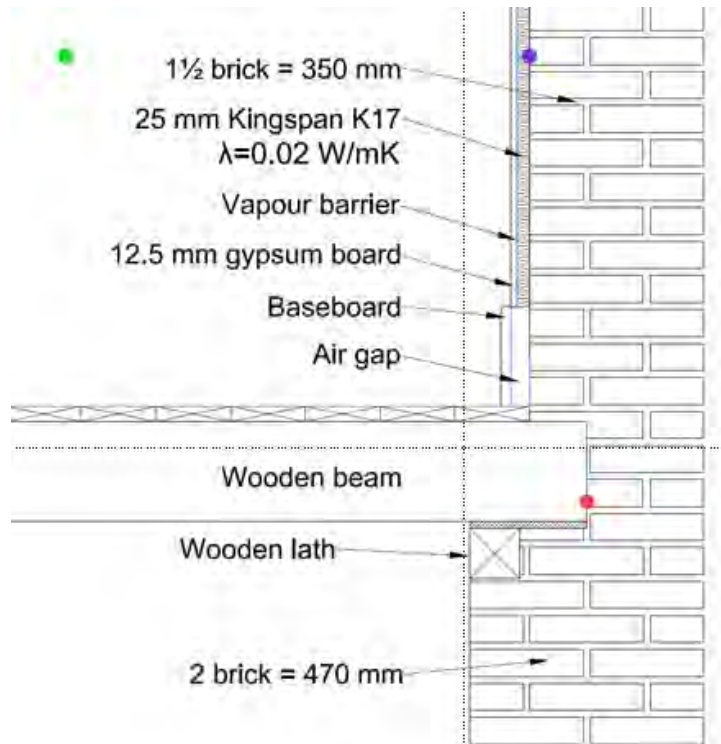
Section of internally insulated facade at Kildevældsgade 69
